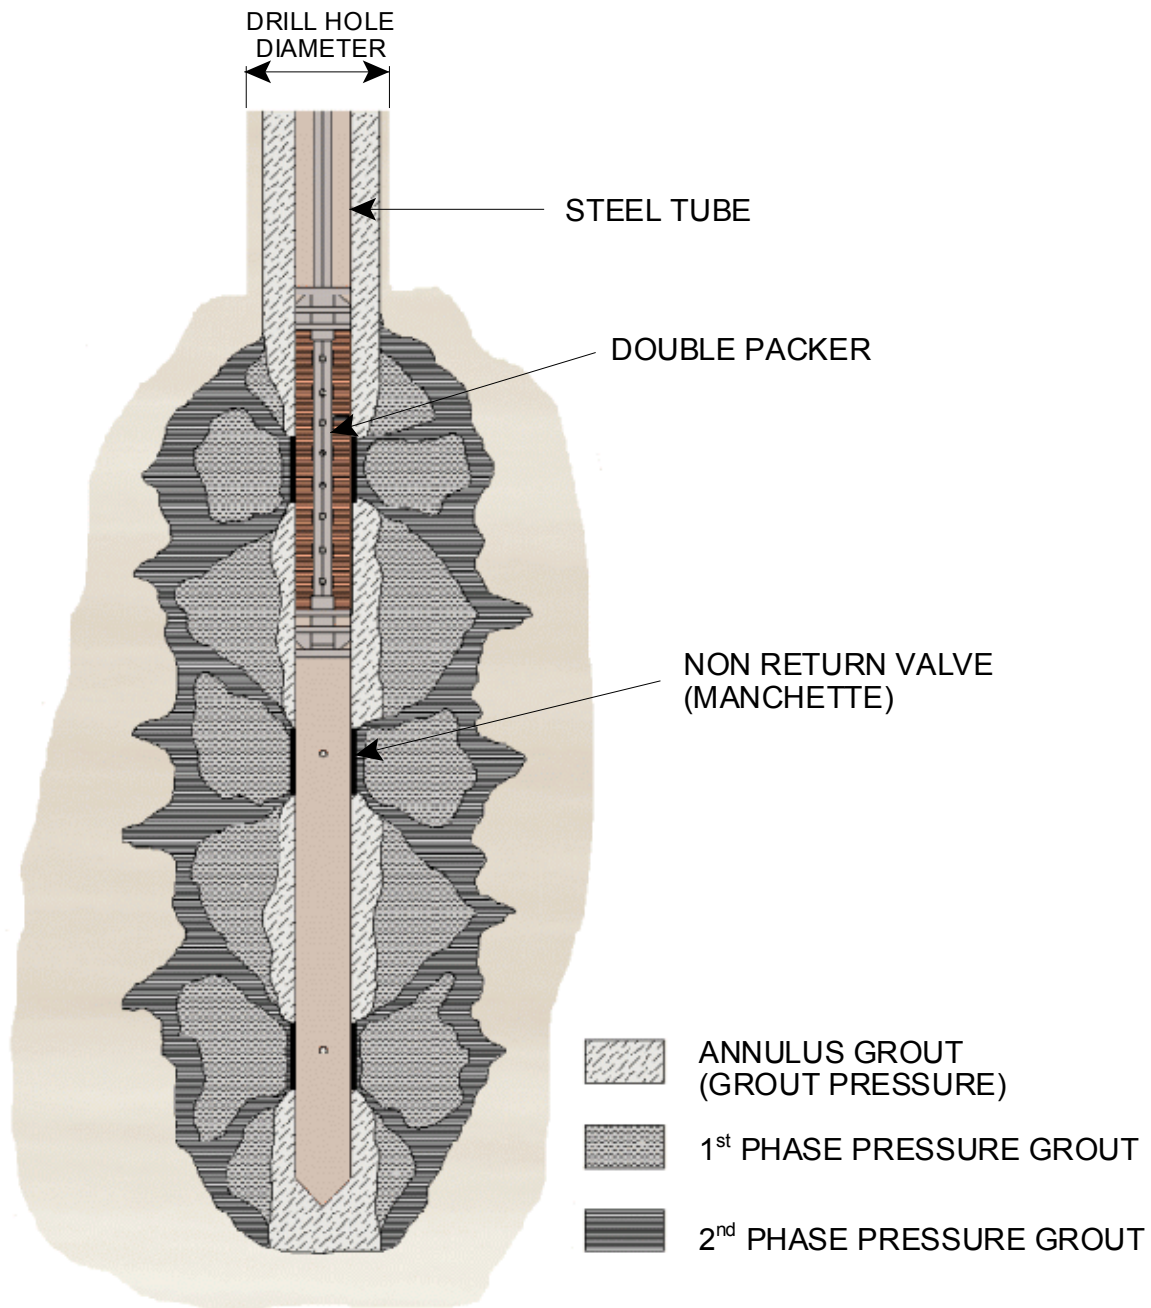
Use of Reinforcement Tube as a Tube à Manchette Postgrouting System.
